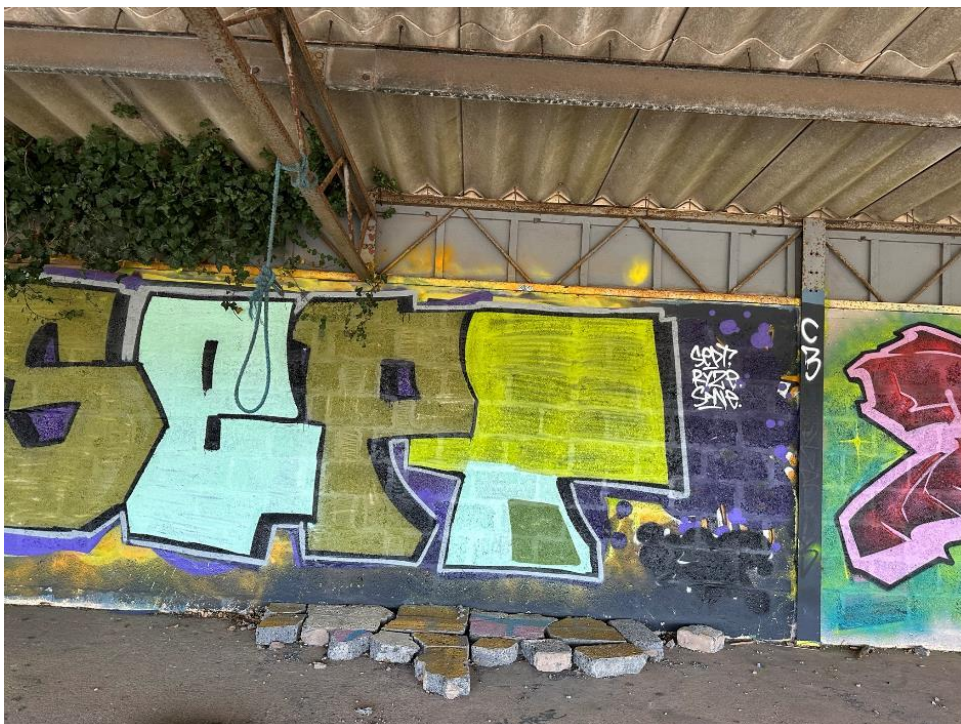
Eastern Grandstand rear elevation demolished toilet block unstable wall
